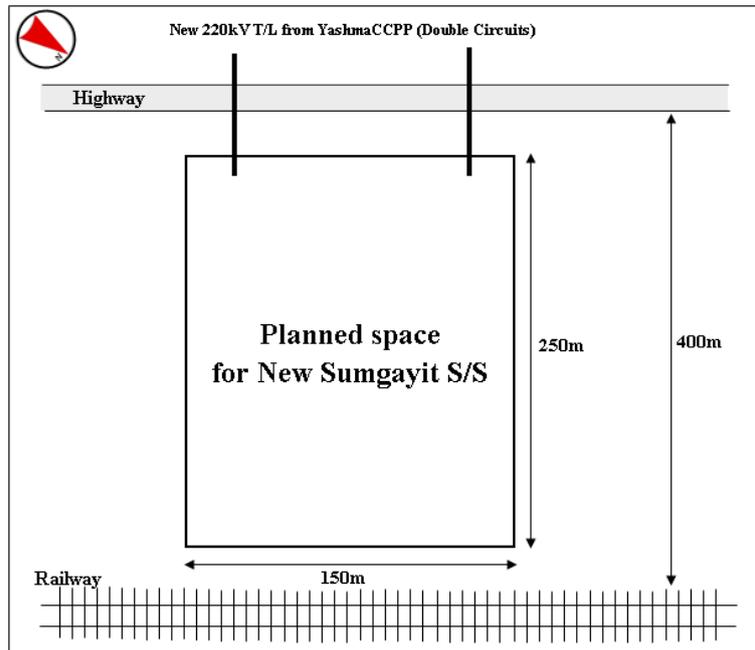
Planned Construction Site for Sumgayit (STP) S/S
